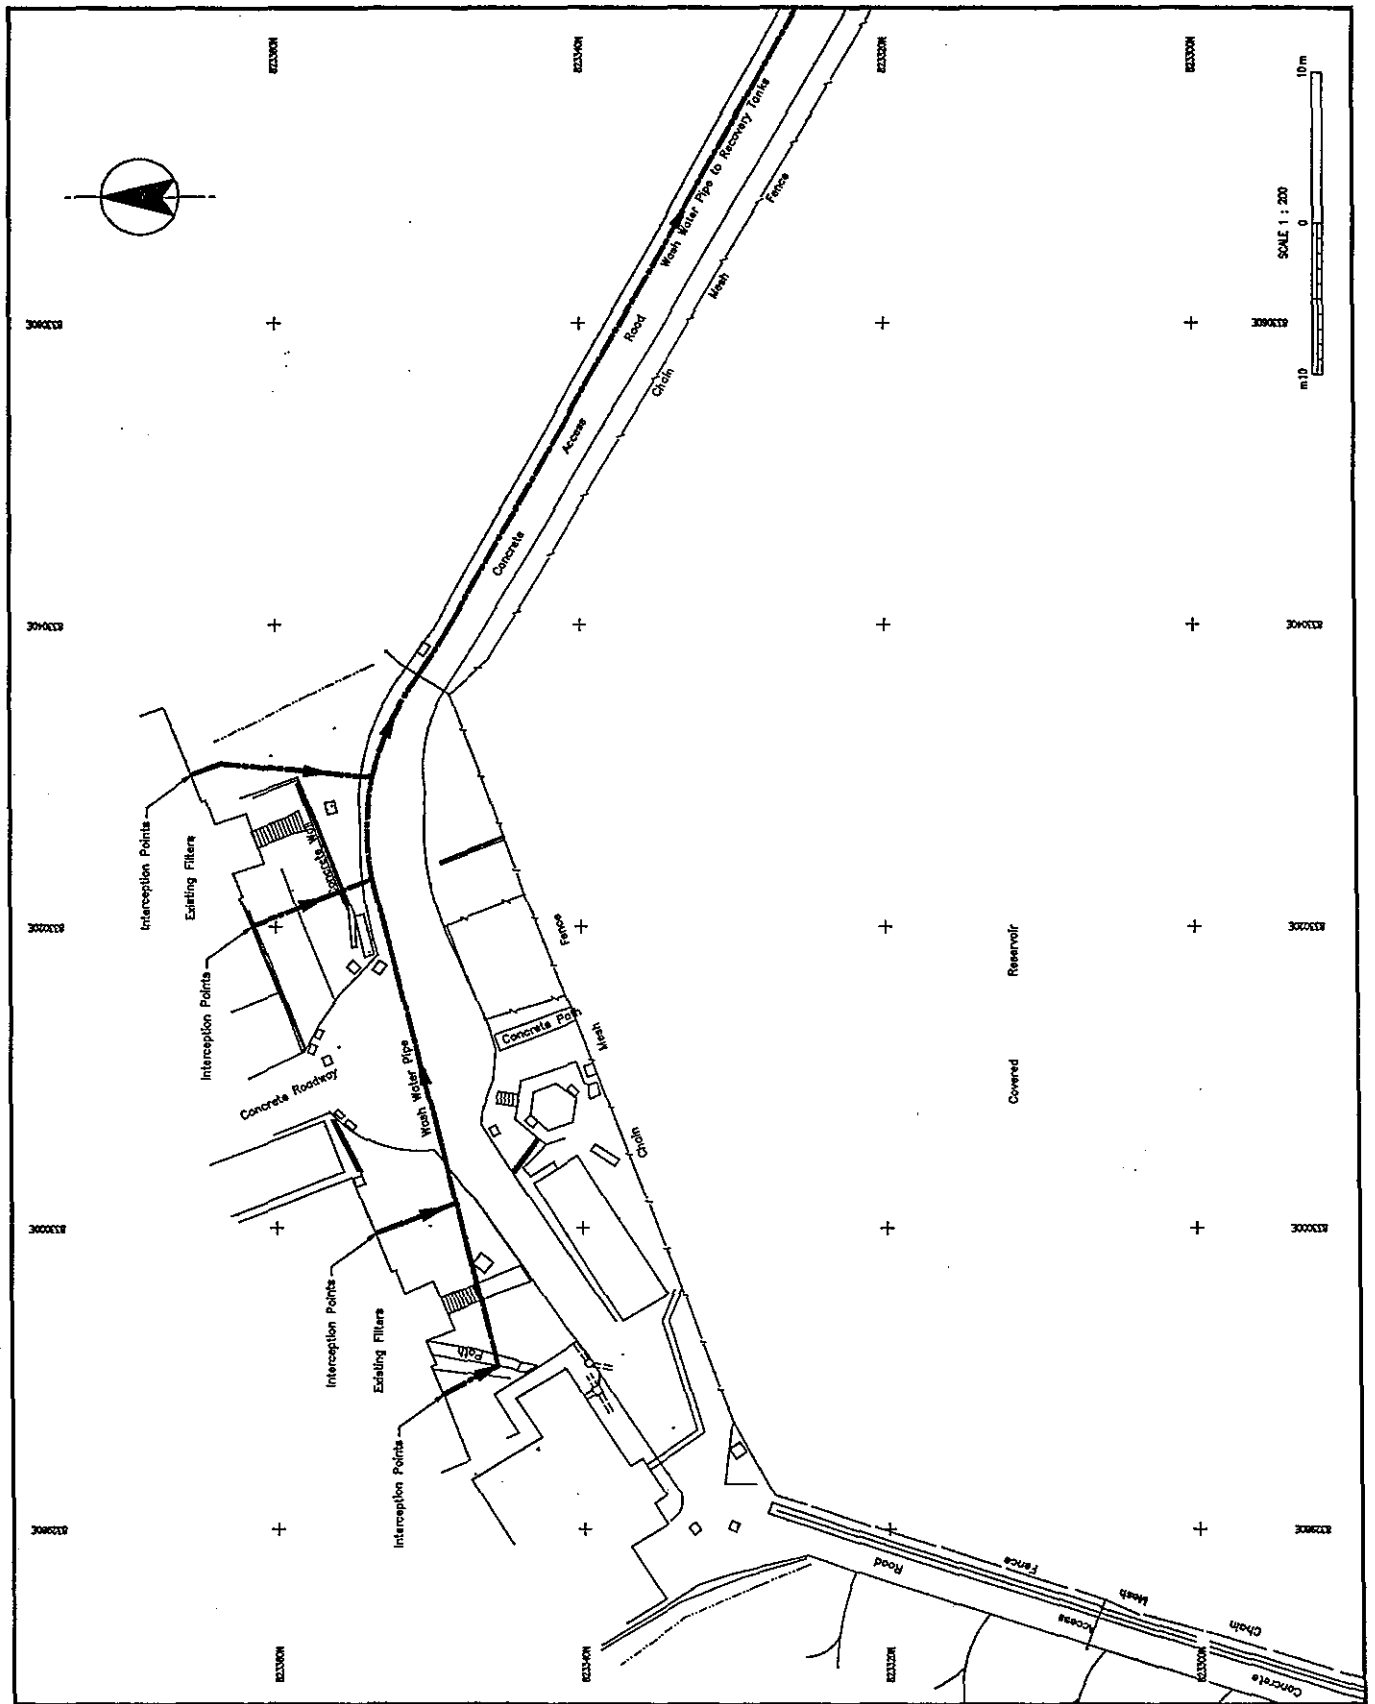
Layout of Proposed Sludge Pipeline at Shek Lei Pui WTW
